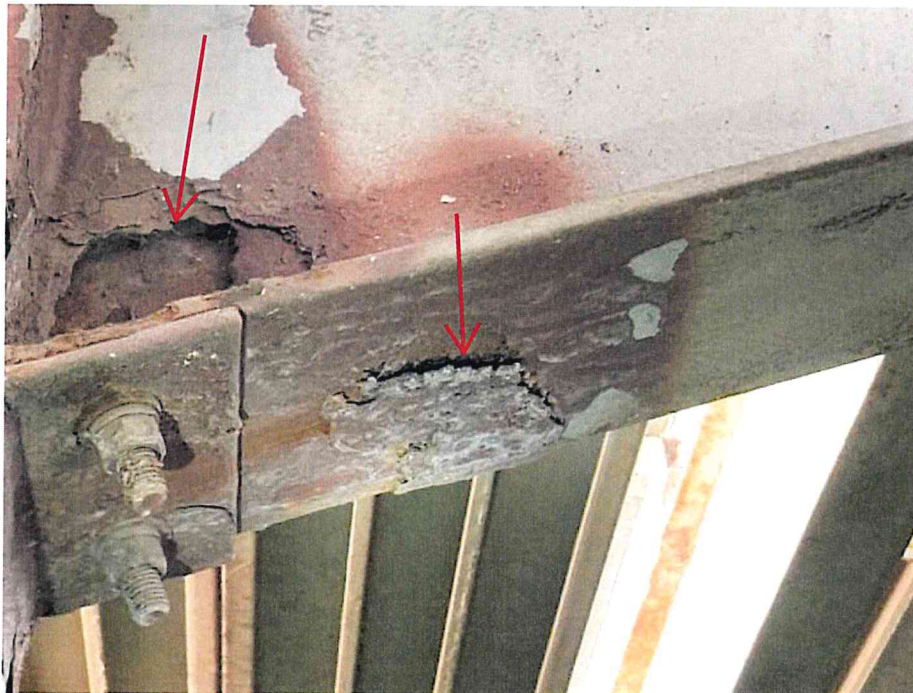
Photo showing severe corrosion at beam web & flange near column cap plate (indicated by red arrows)
